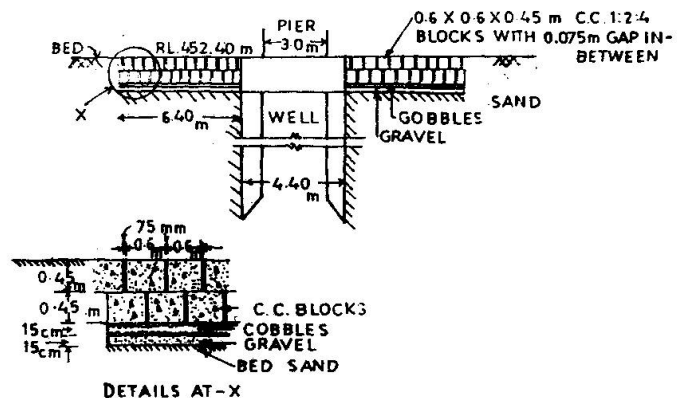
TYPICAL PIER PROTECTION AT TOKA BRIDGE
